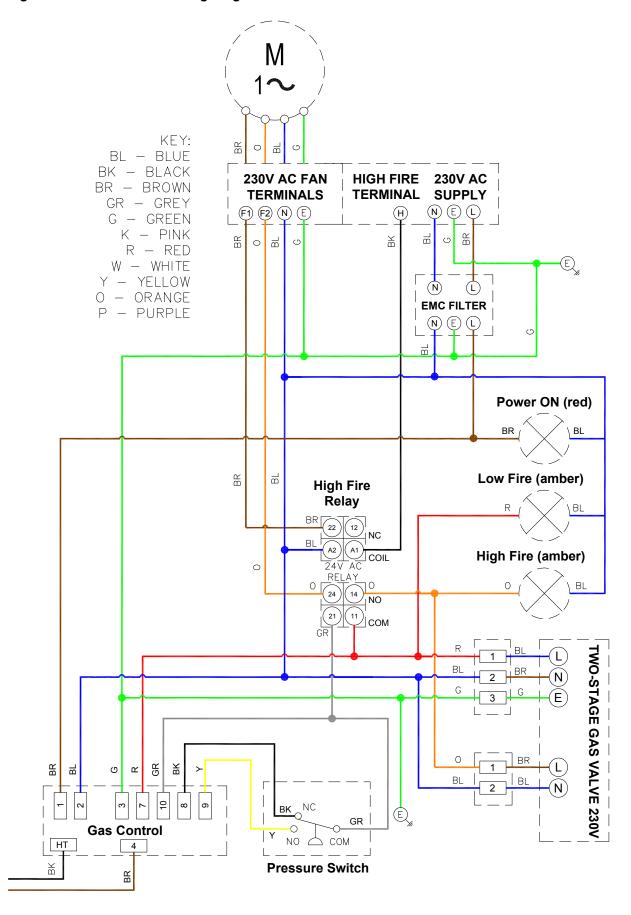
a Typical VTUT/VTAUT/VTCUT Wiring Connections
